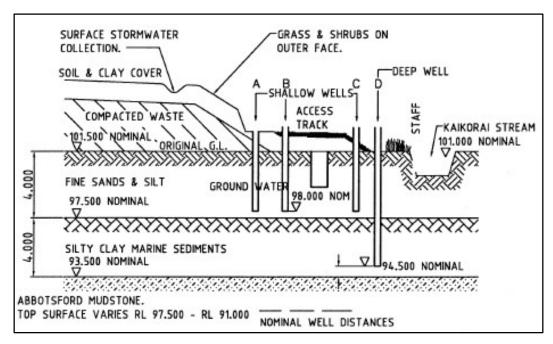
Schematic cross section through an example monitoring well line and the leachate collection trench (Source DCC Landfill Annual Survey Plans – July 2004 Sheet No. G11).
